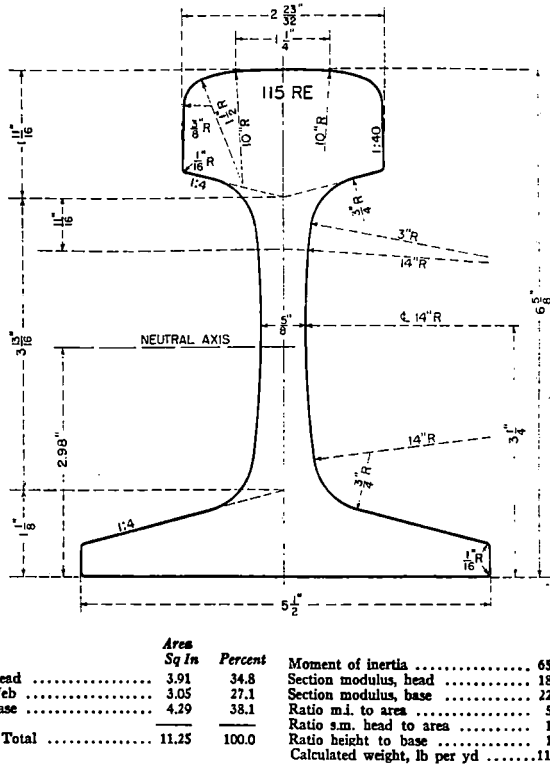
AREA 115-RE Rail Section, Adopted in 1947.
